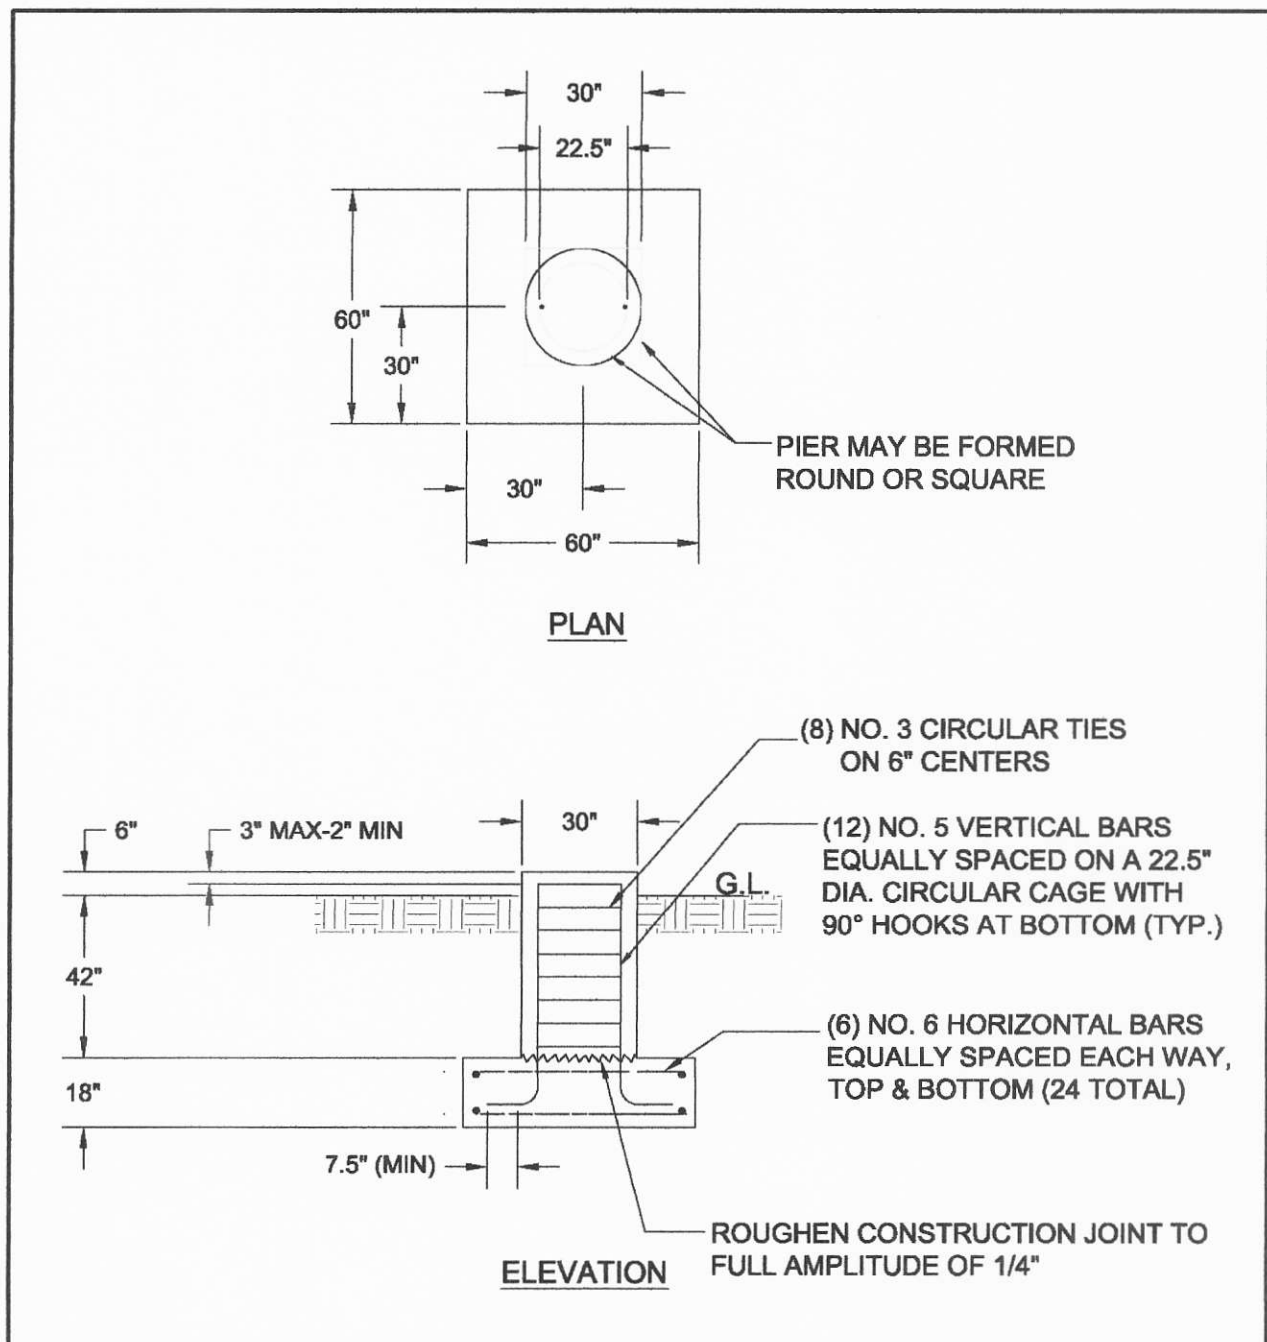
Pier-Pad Base Foundation for GL 60-120 Towers
